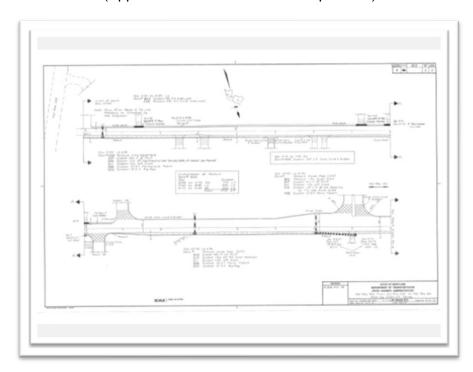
Construction plan sheet (Appendix A2 contains a 11x17 printout.)
